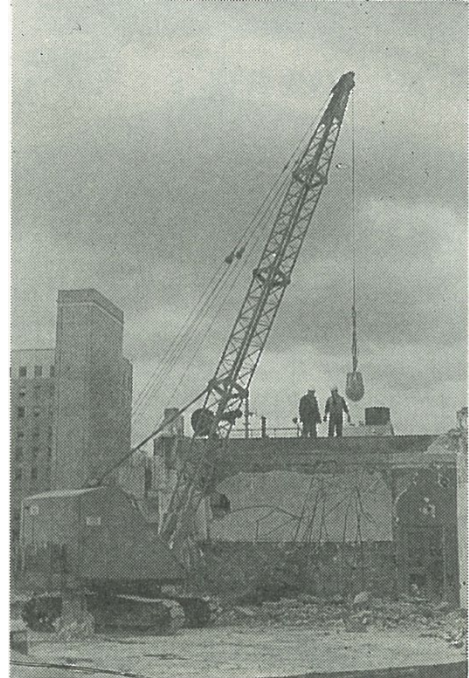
Demolition due to a wrecking ball (Bank of Japan Head Office around 1970)
